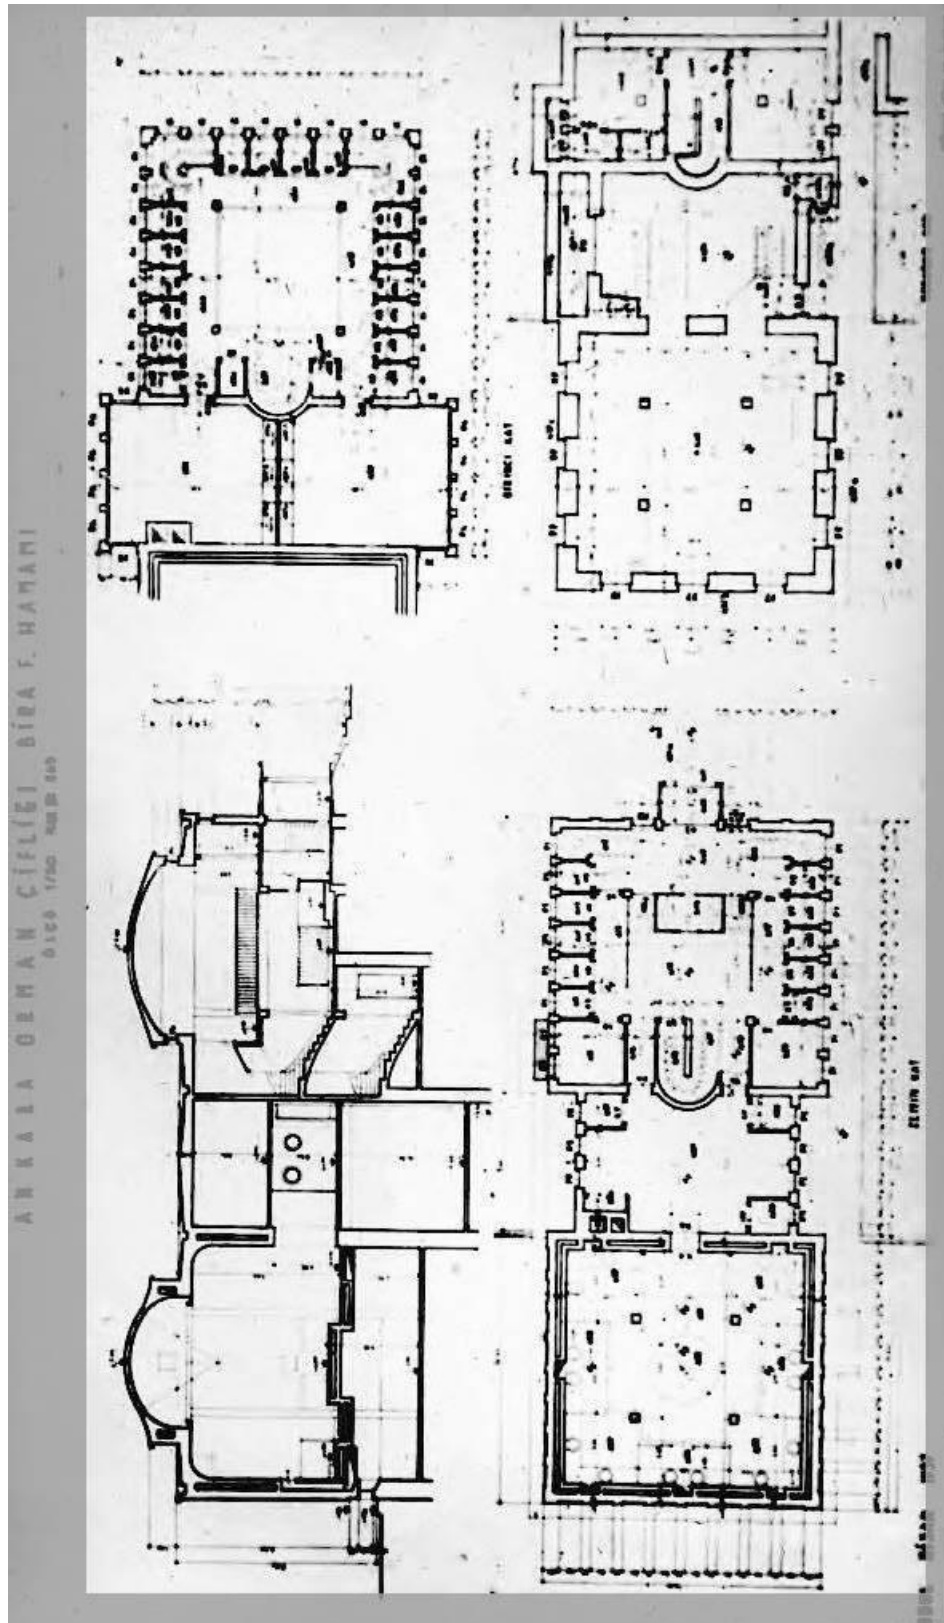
Plan and Section drawings (ALPAGUT,2010:256)
